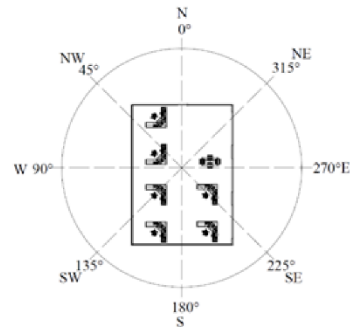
Sample Office Space Floor Plan and Orientation Angle for Simulation.
